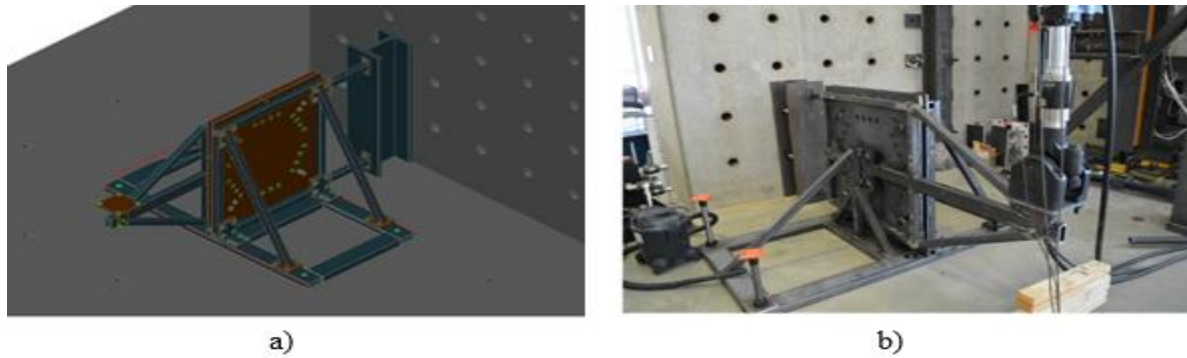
a) Rotational shear device for SR3; b) Rotational shear testing of SR3 [17]
